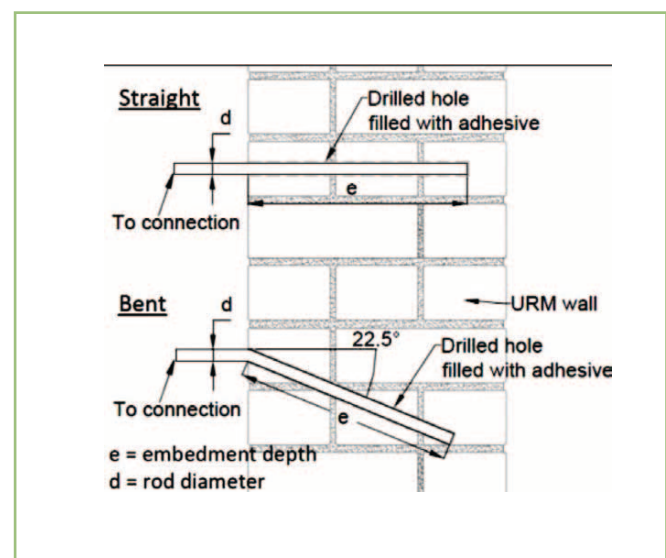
Typical diaphragm-to-wall horizontal & bent adhesive anchors.
